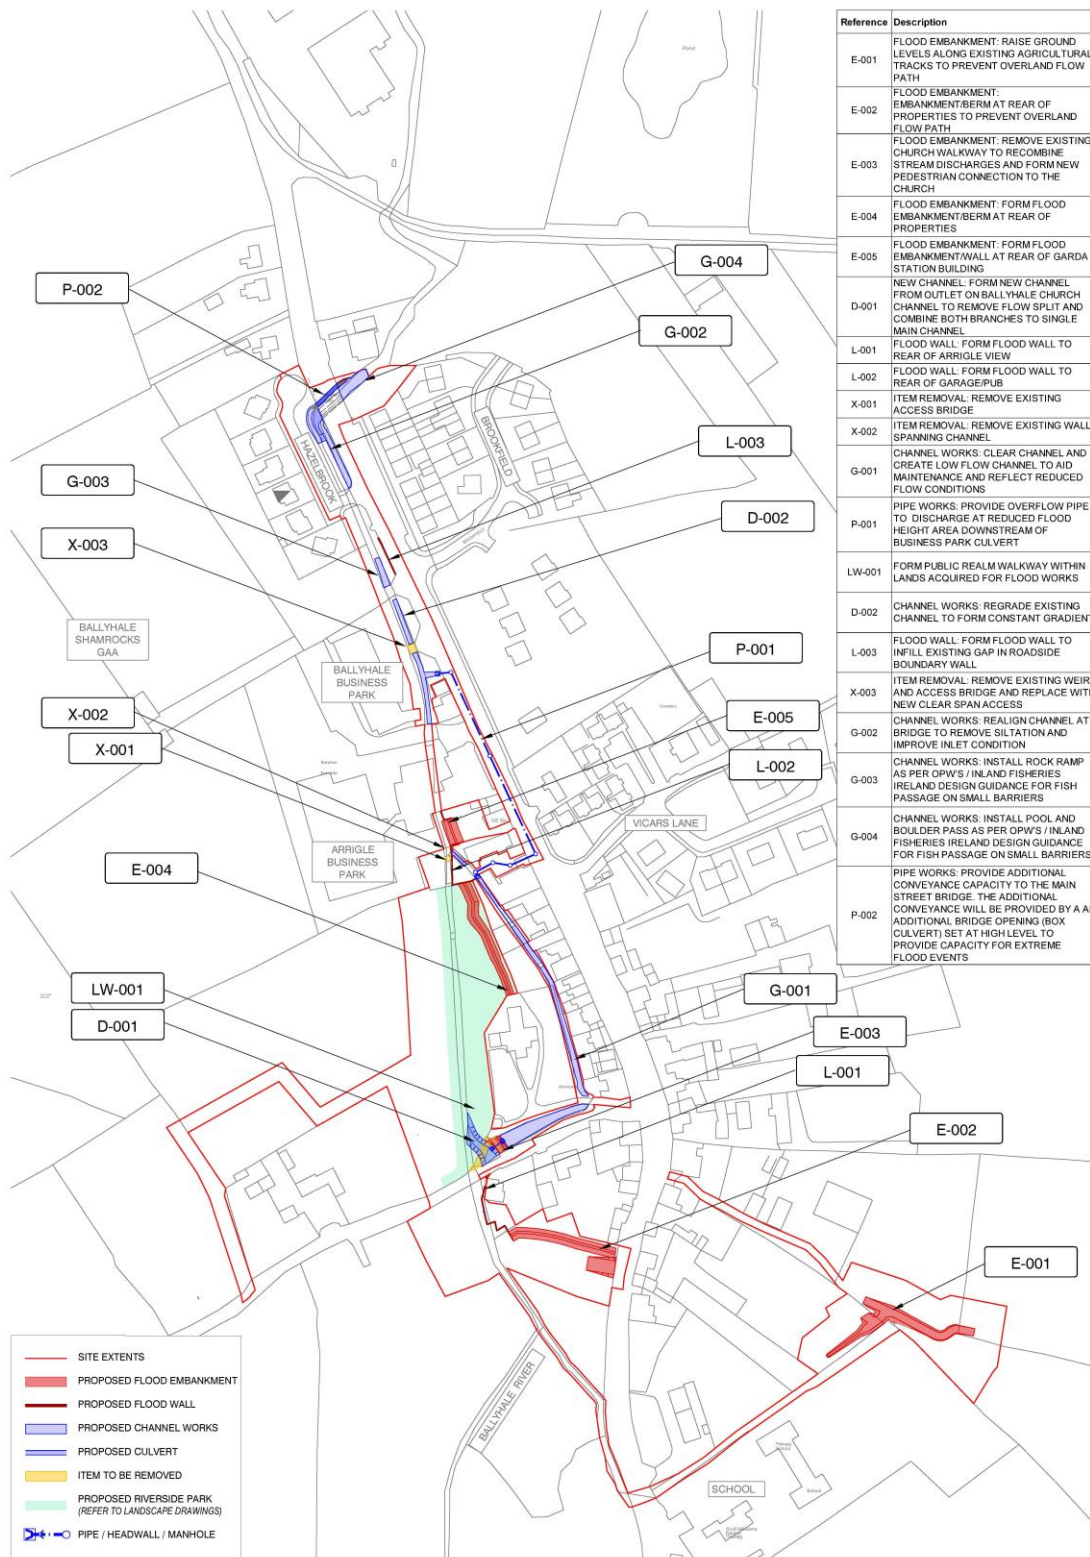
Ballyhale Flood Relief Scheme – General Layout
